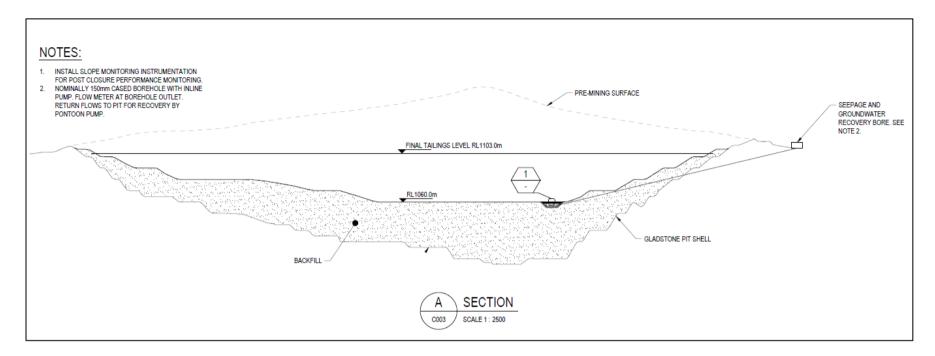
Typical Cross Section of the GOP TSF (GHD (2025a)
